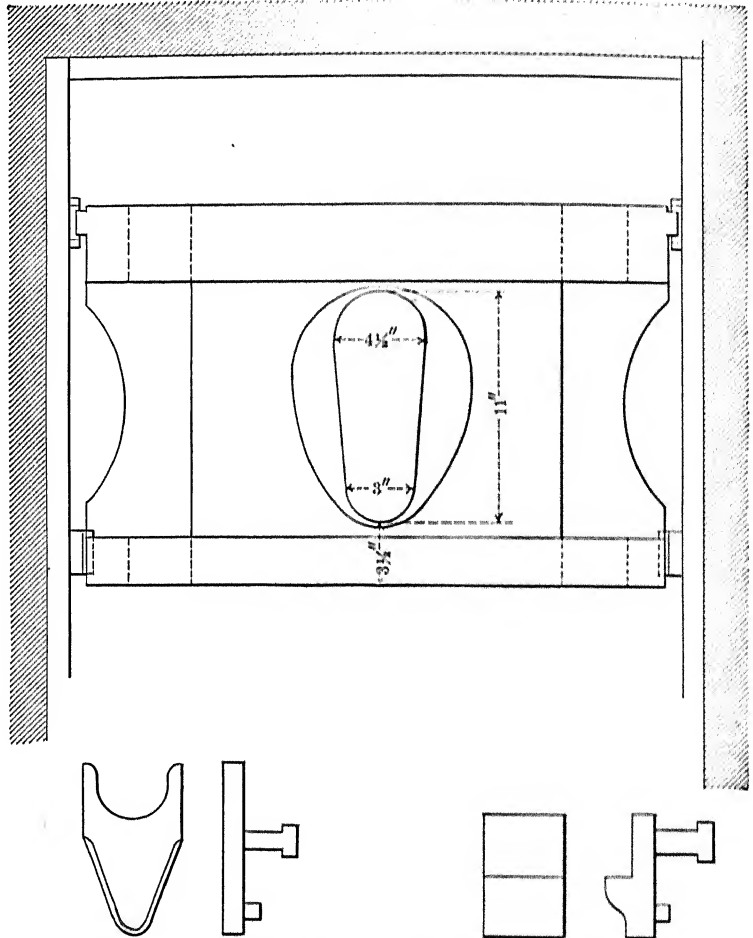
Detail Plan of Full-size Water-closet Seat.
